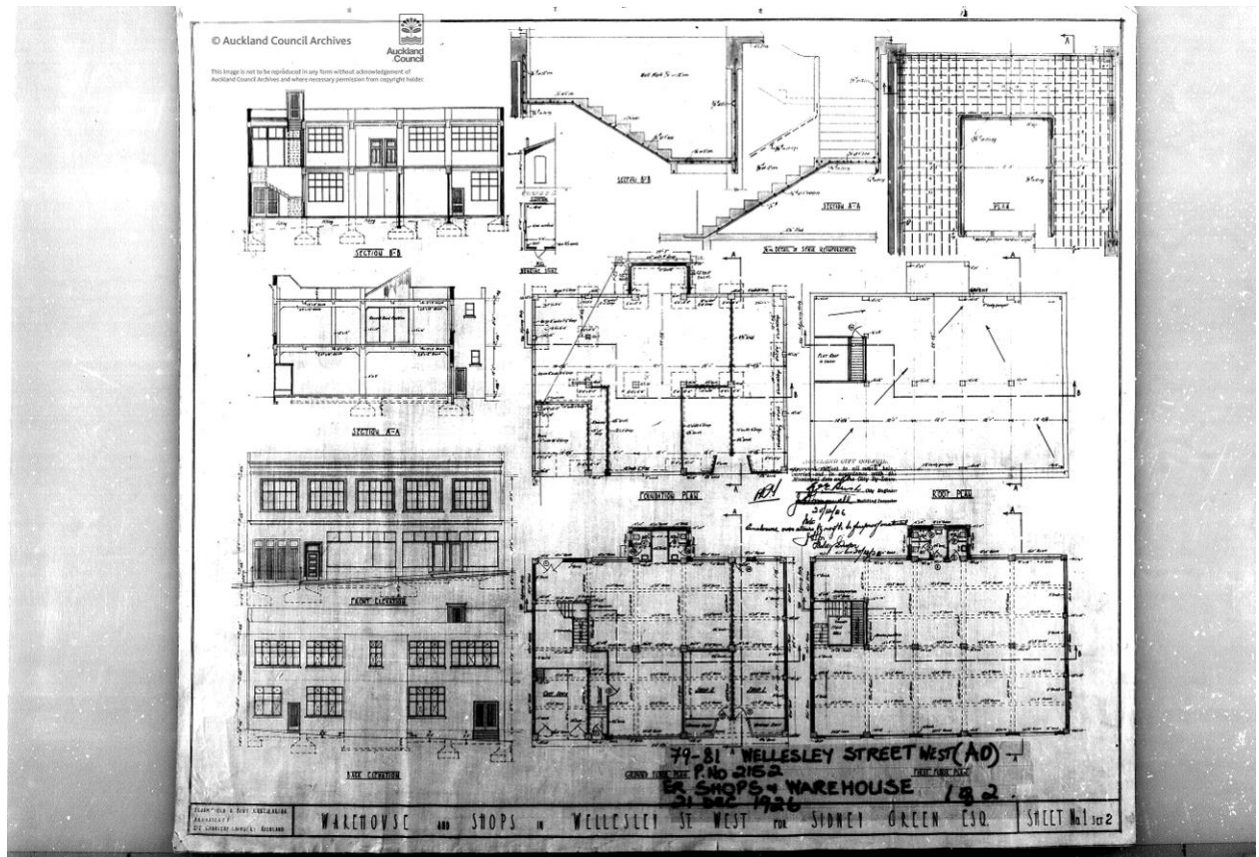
Plan, dated 21 December 1926, showing proposed shops and warehouse at 79-81 Wellesley Street West (source: AKC339, Permit Number 2152, Auckland Council Archives)
